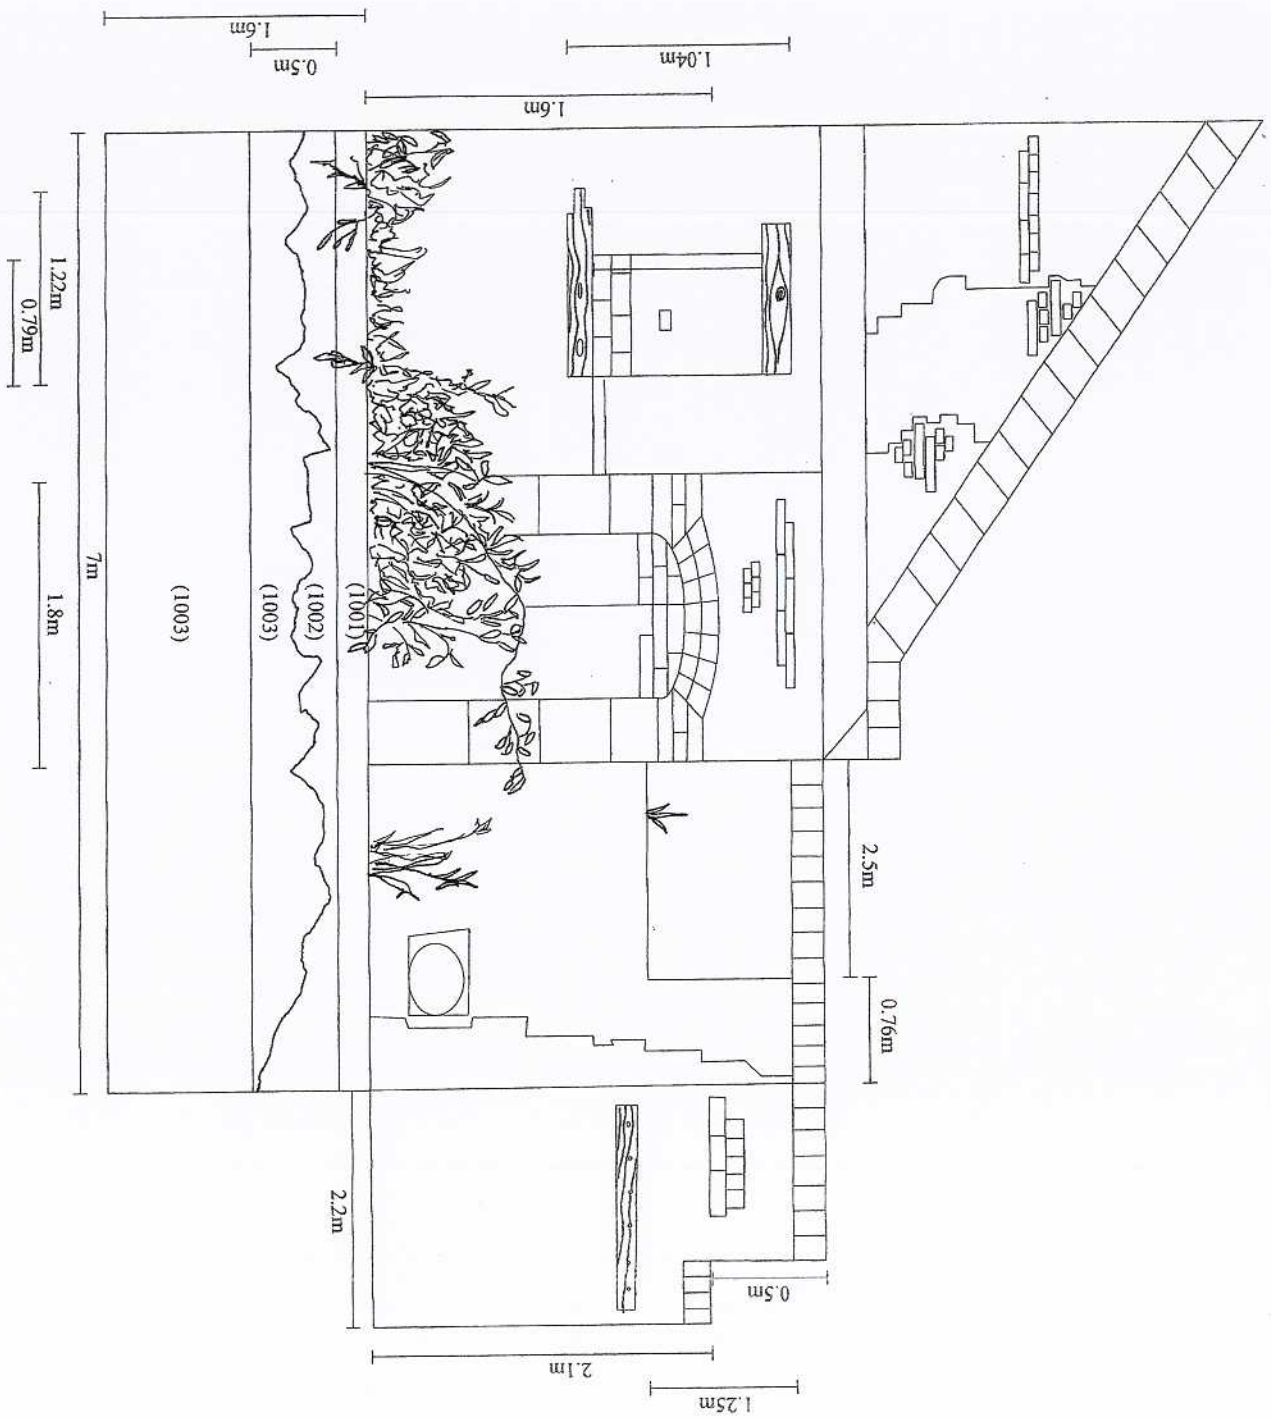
Sketch Section of Boundary Wall to the Rear of 9 St Owens Street
